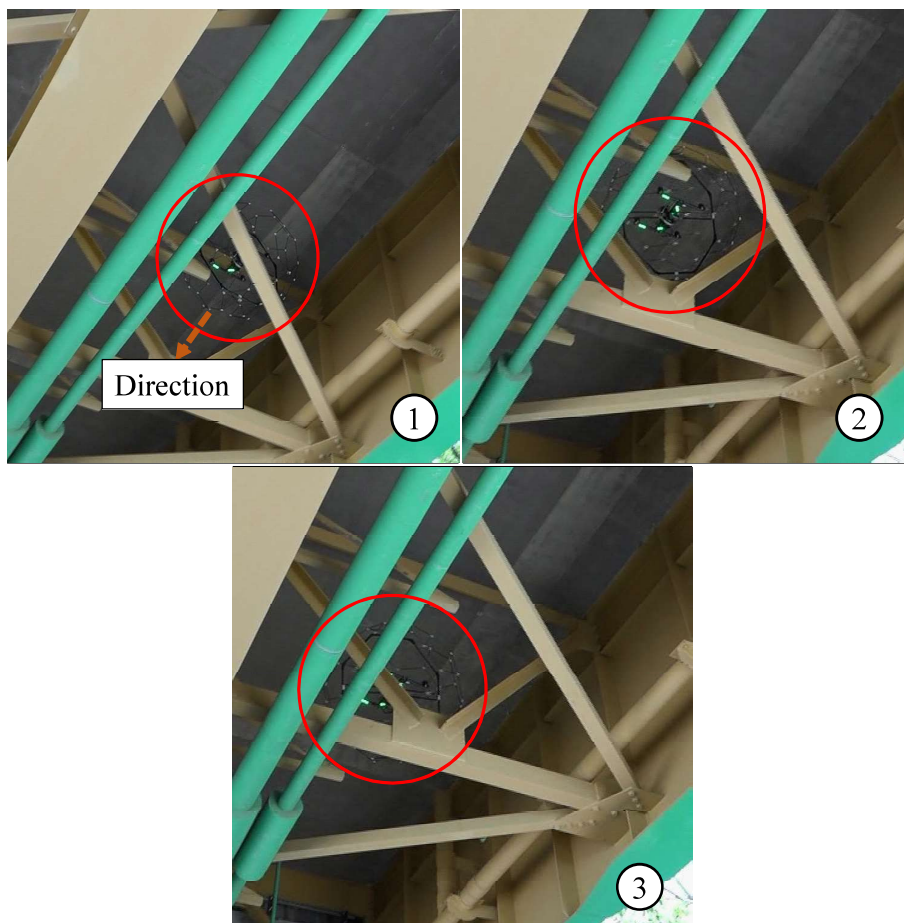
Crossing the steel k-type brace underneath the bridge.
